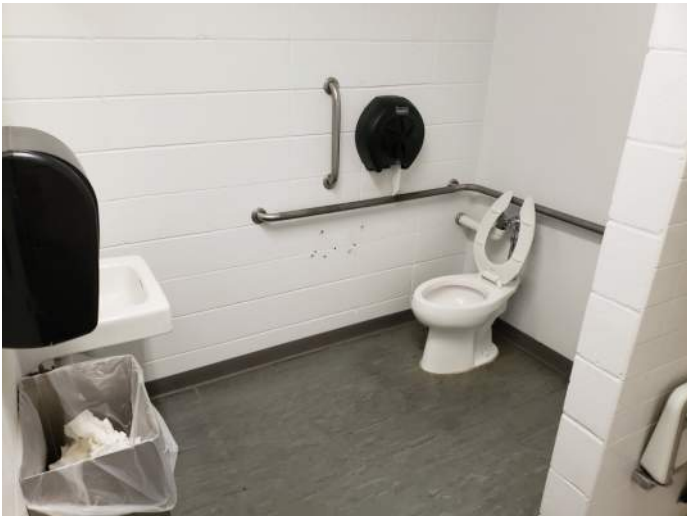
Restroom and shower are accessible. Floor finishes are worn.
